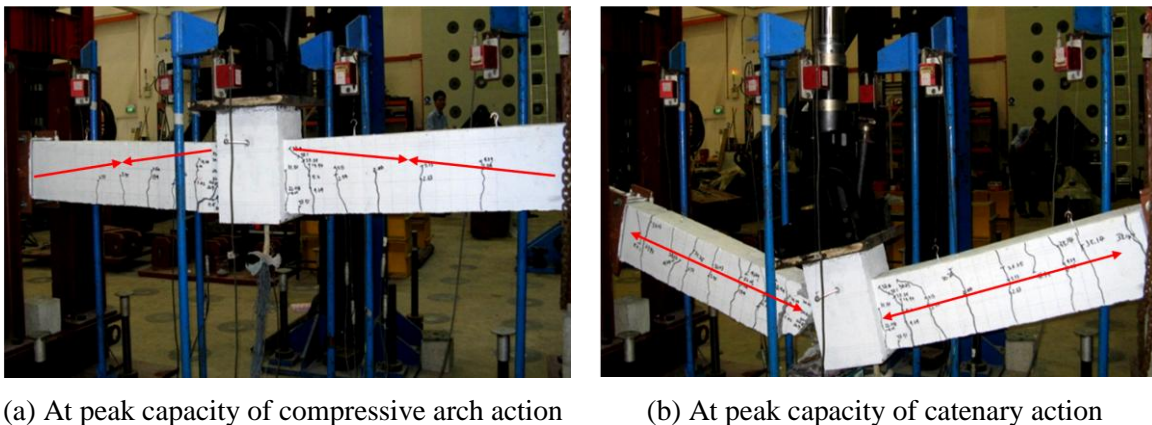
Beam crack patterns at different structural mechanisms
